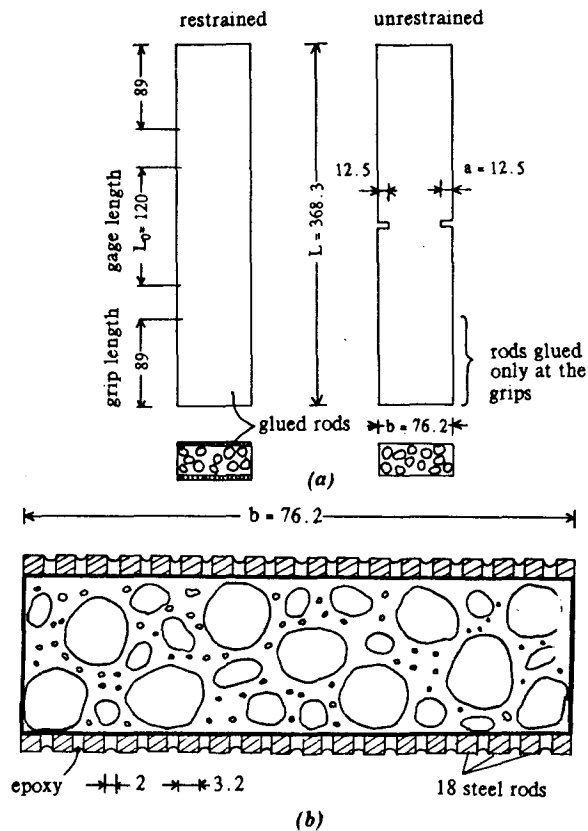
(a) Notched and Unnotched Specimen Tested; (b) Arrangement of Steel Bars at Surface of Concrete (All Dimensions in mm)
